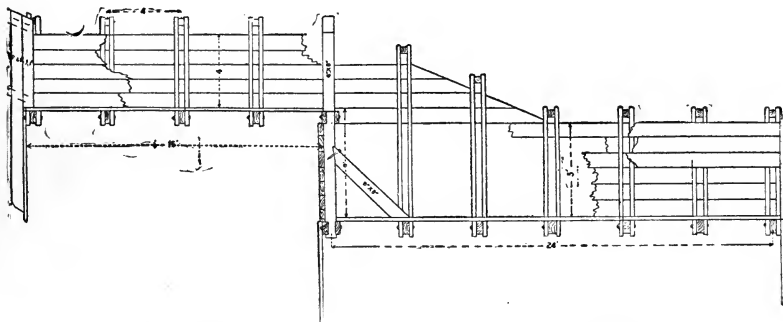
LONGITUDINAL SECTION OF FALL, ARIZONA CANAL.
